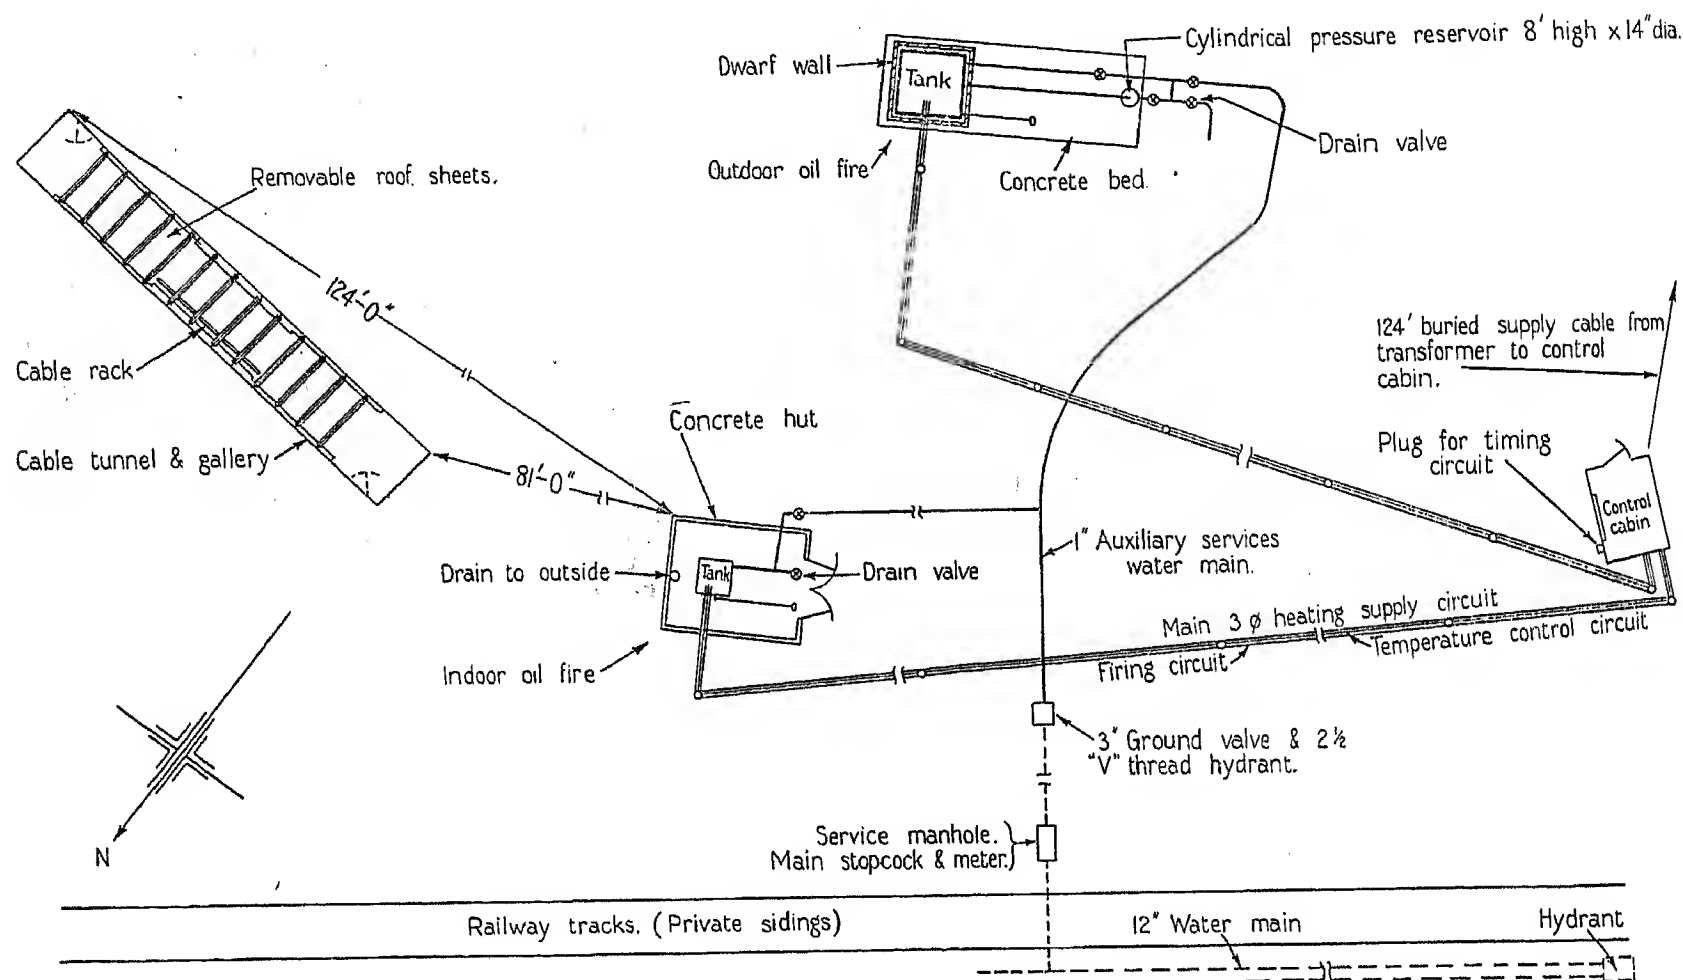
Layout plan of installation for E.R.A. fire tests at Barking.
